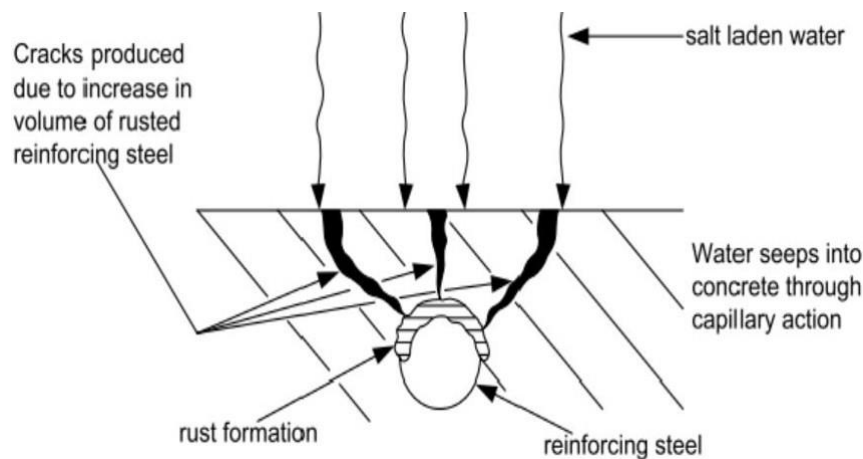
3 Chloride-induced reinforcement corrosion in concrete (Ontario. Transportation Engineering Branch. Bridge Office. 2008)
